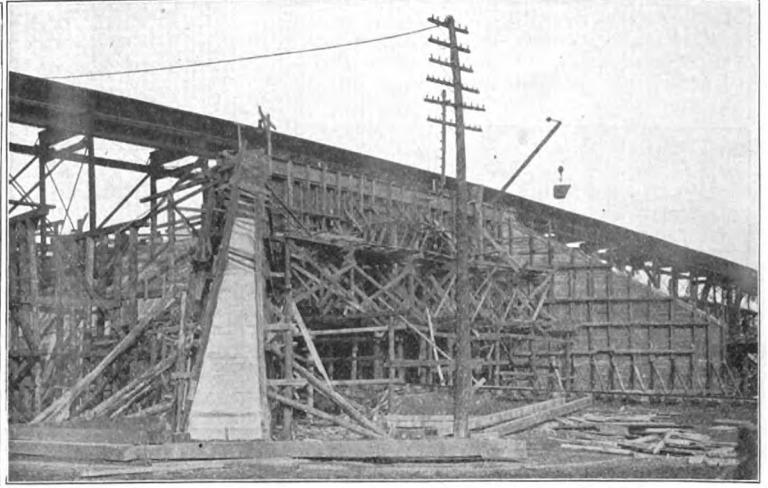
FORMS FOR THE 60-FT. CONCRETE ARCH BRIDGE AT CAIRO.
